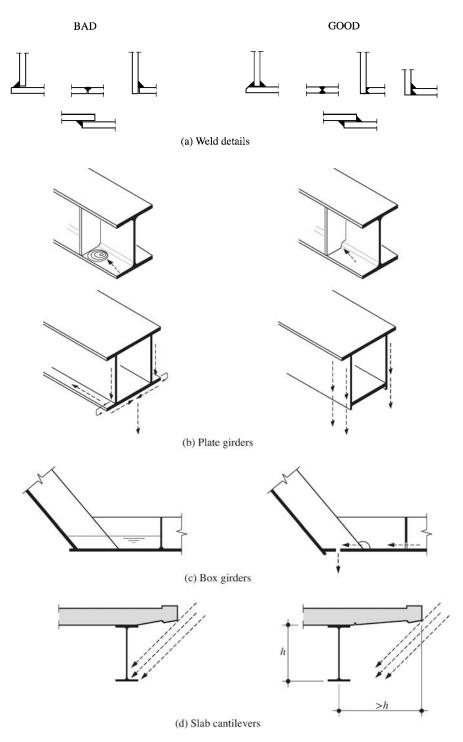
Examples of good and bad construction details to avoid standing water and moisture.
